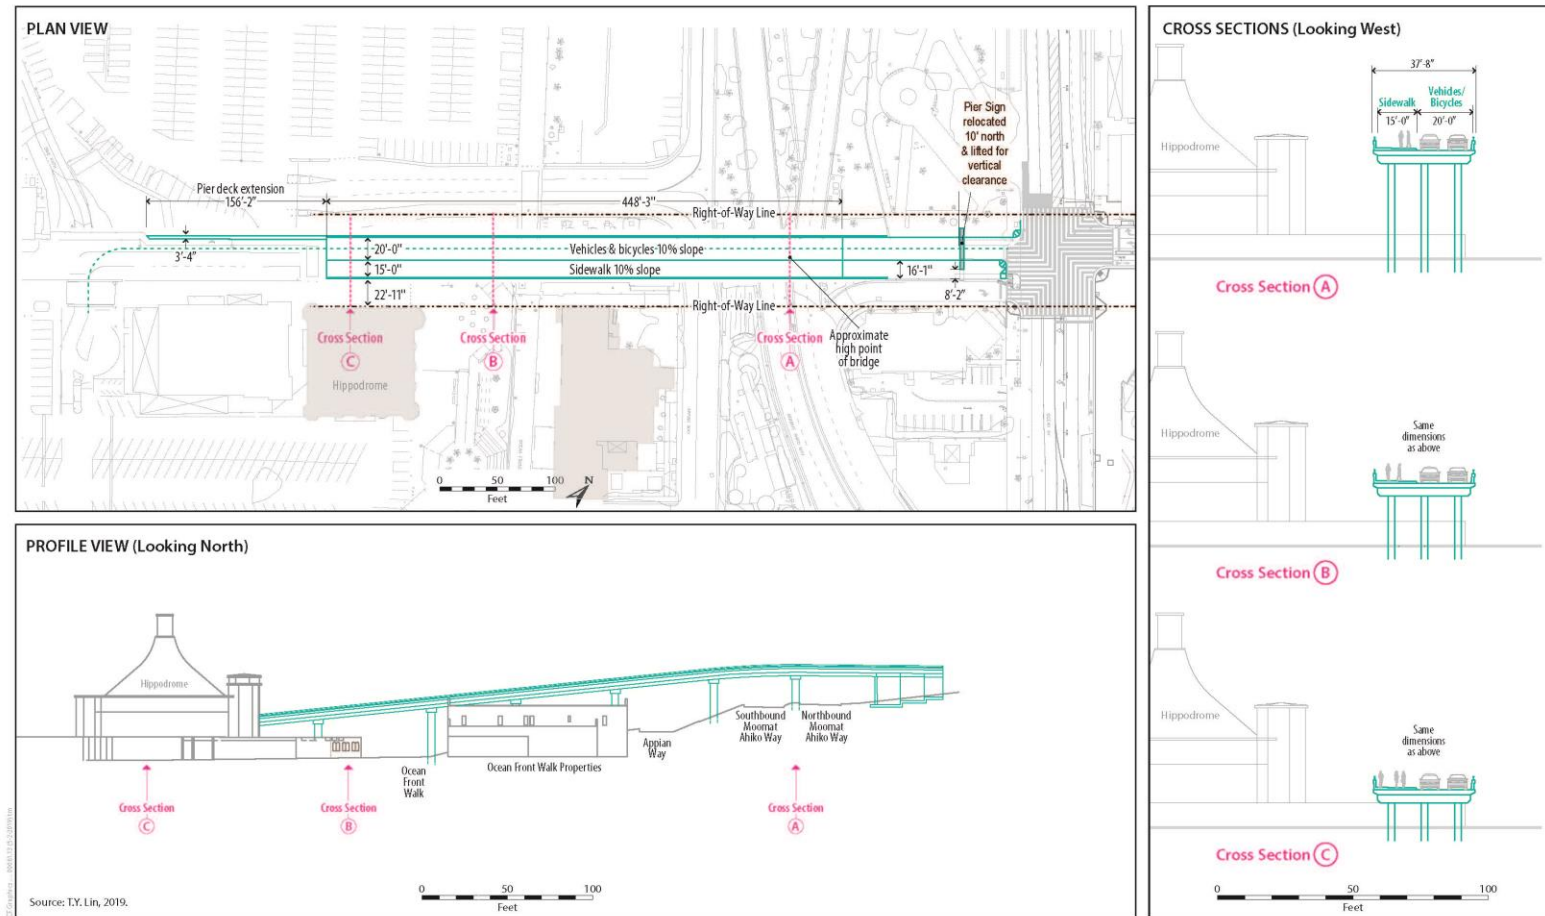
Alternative 1, In-Kind Pier Bridge Replacement with Northside Sidewalk
